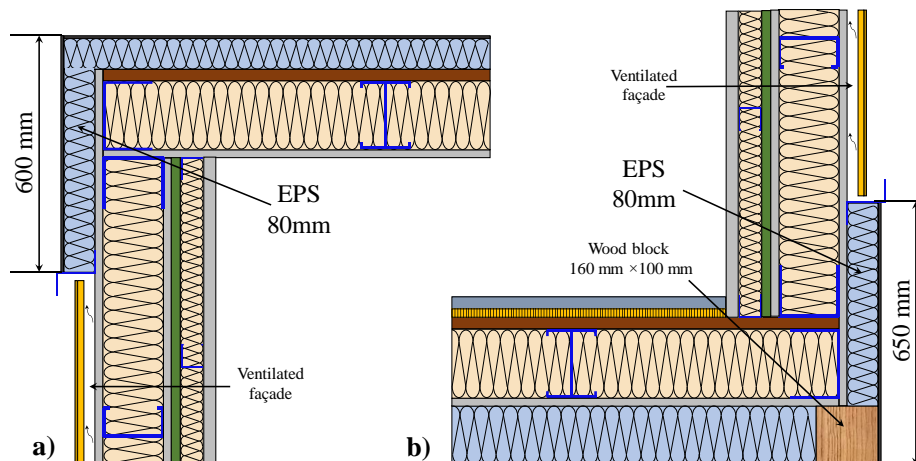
Extra insulation of the walls: a) at the junction with the roof and b) at the junction with the floor.
